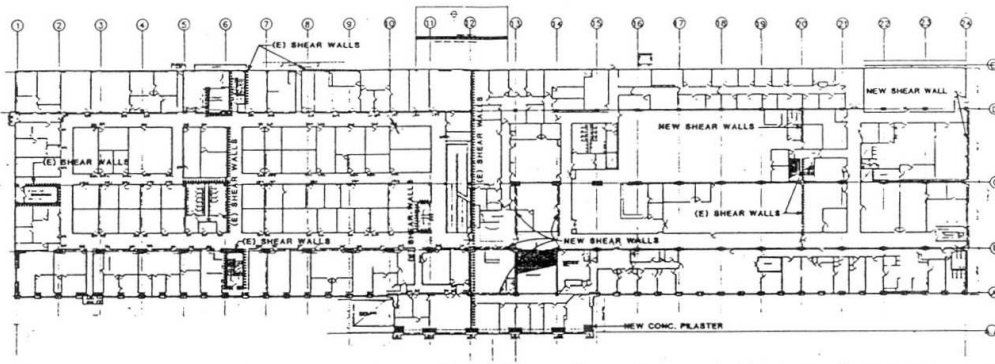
Second Floor of Ferry Building showing existing and recommended locations of shear walls. The tower is between columns 12-13-A-B.
